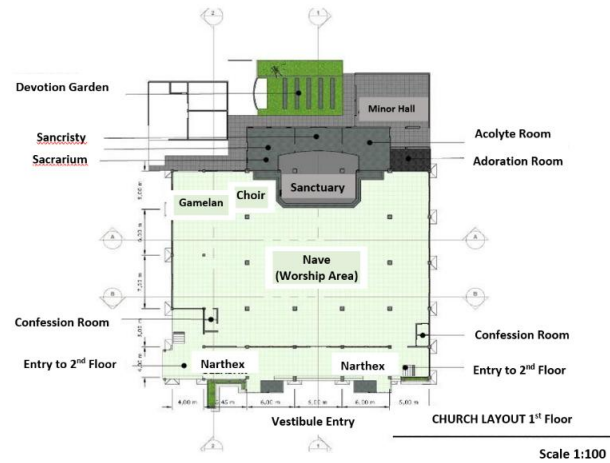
Floor plan of St. Pius X Church prior to renovation (Authors' own documentation, 2025)
